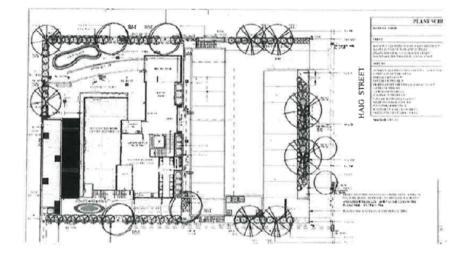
Elect "No Stopping" sign to the frontage of the proposed development site 3-5 Haig St
